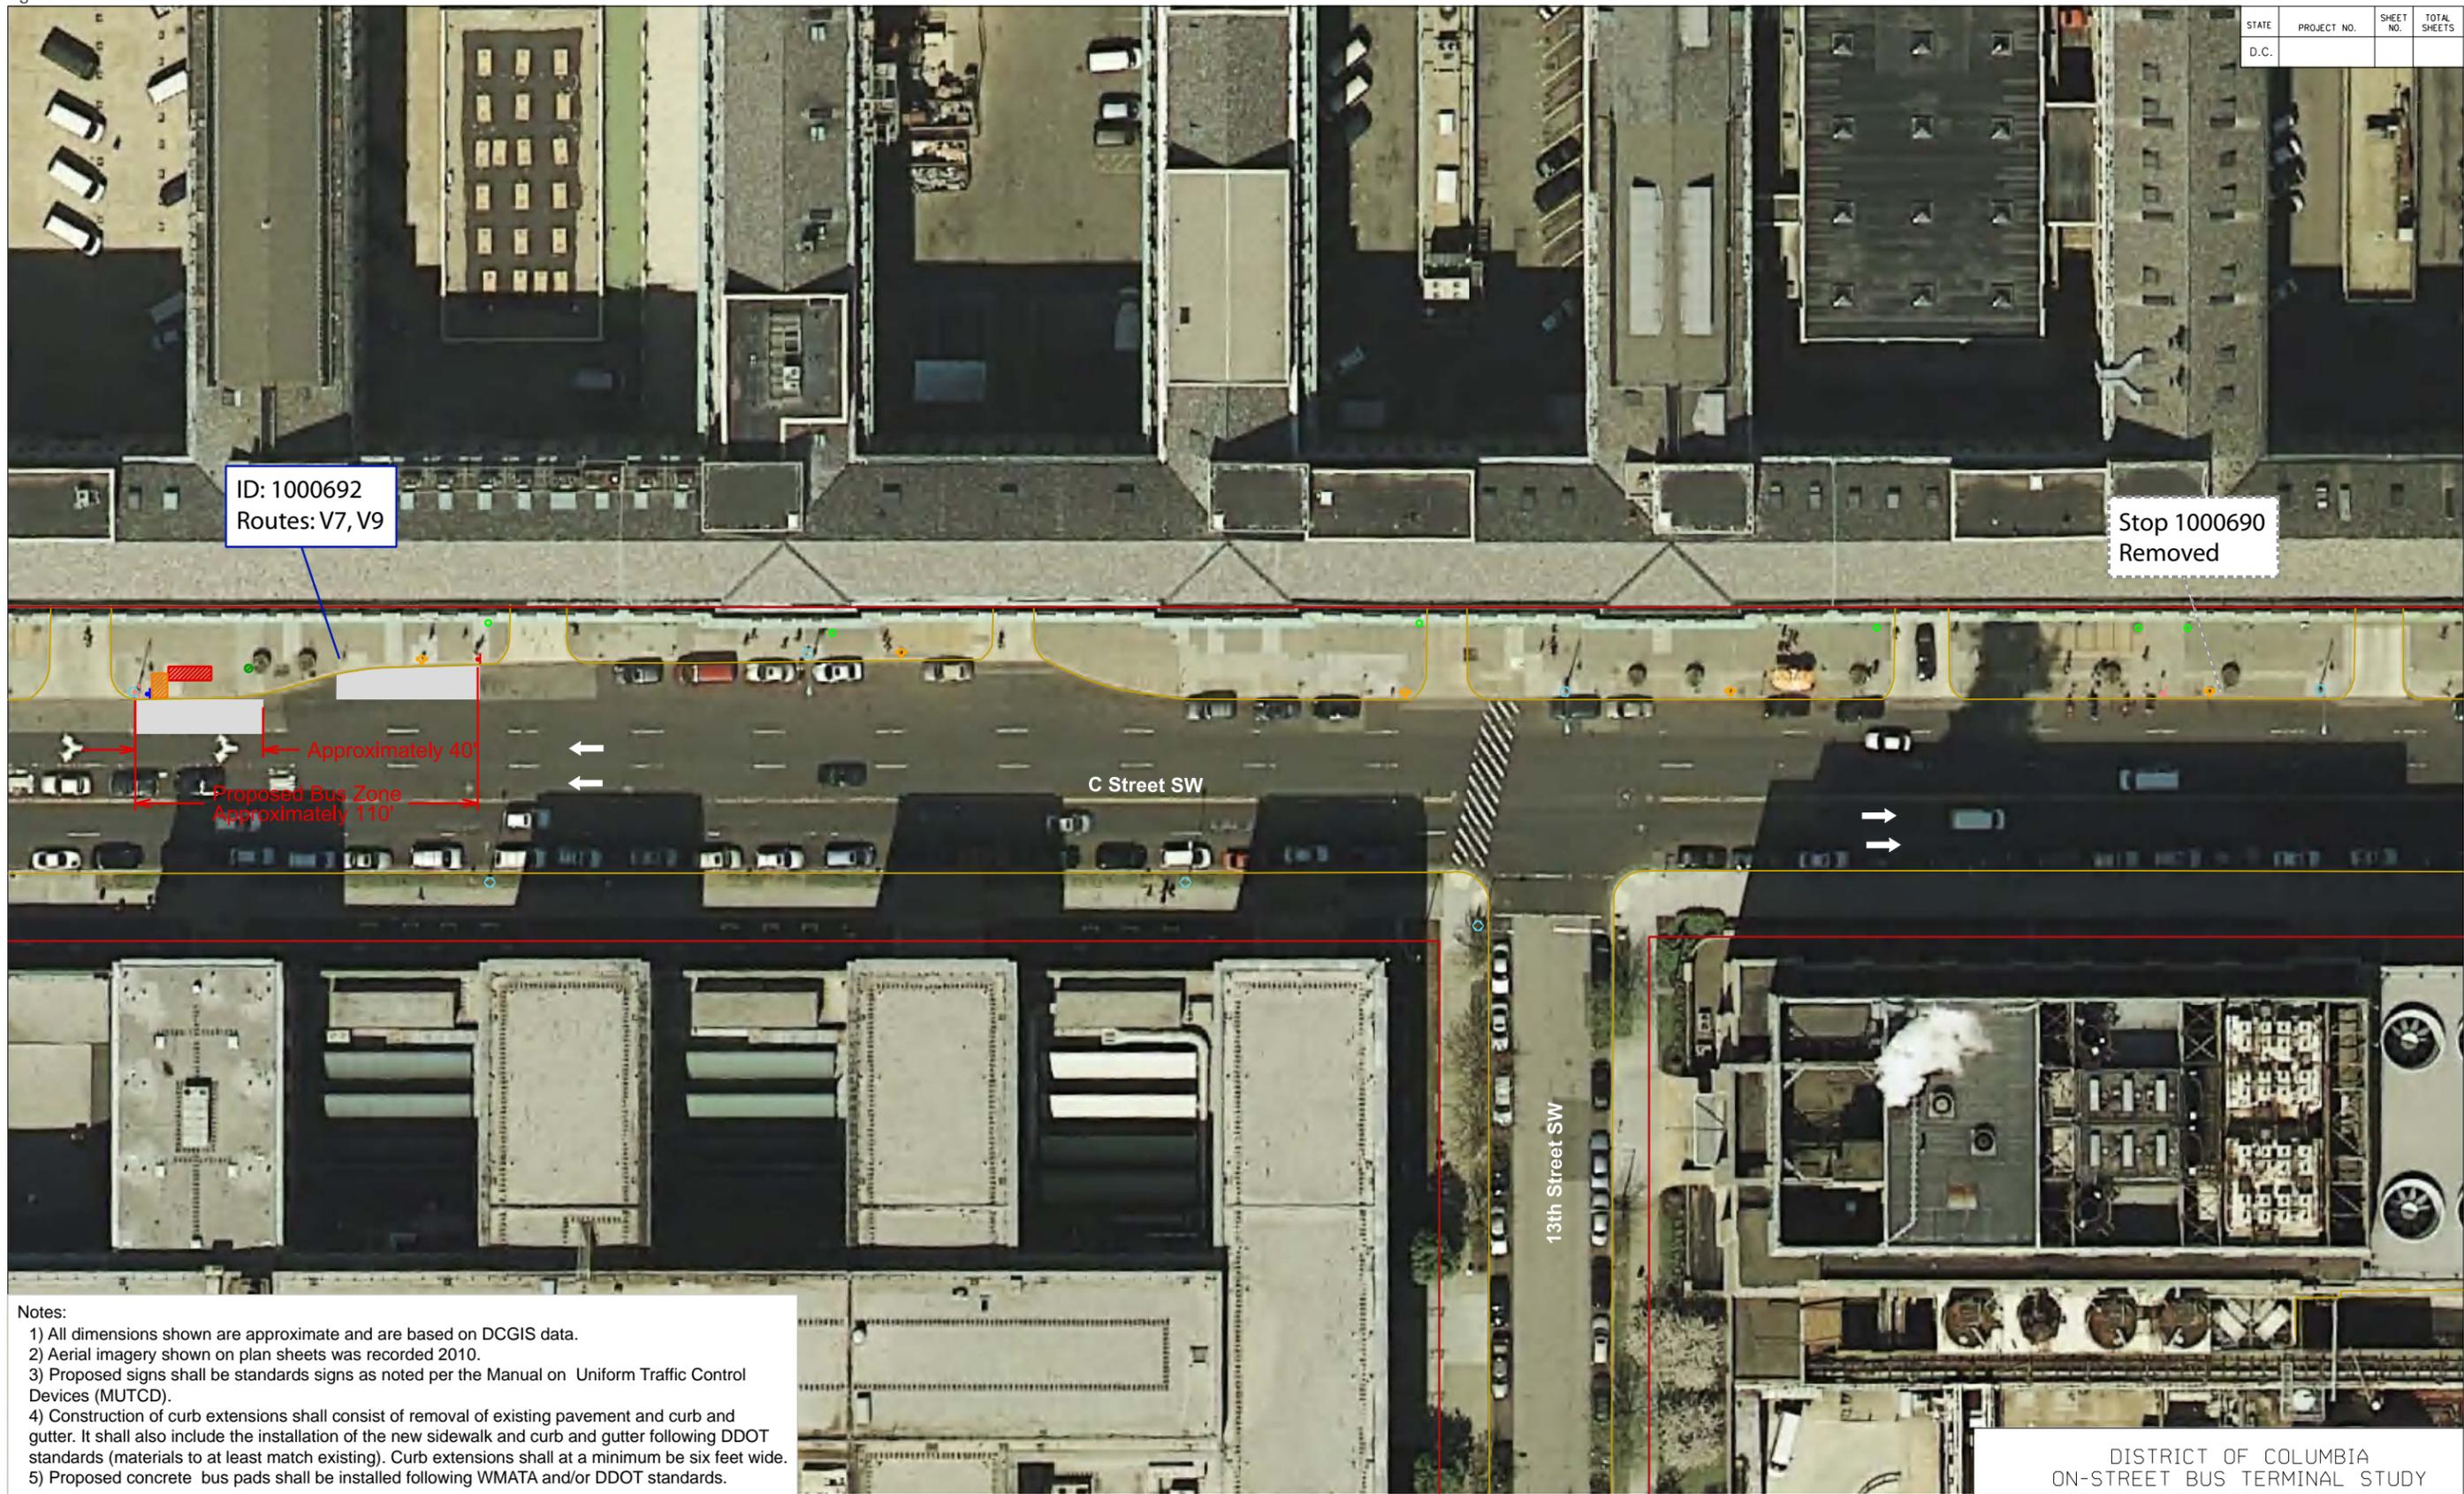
Proposed Shelter Configuration at Stop 1000692 on C Street SW
